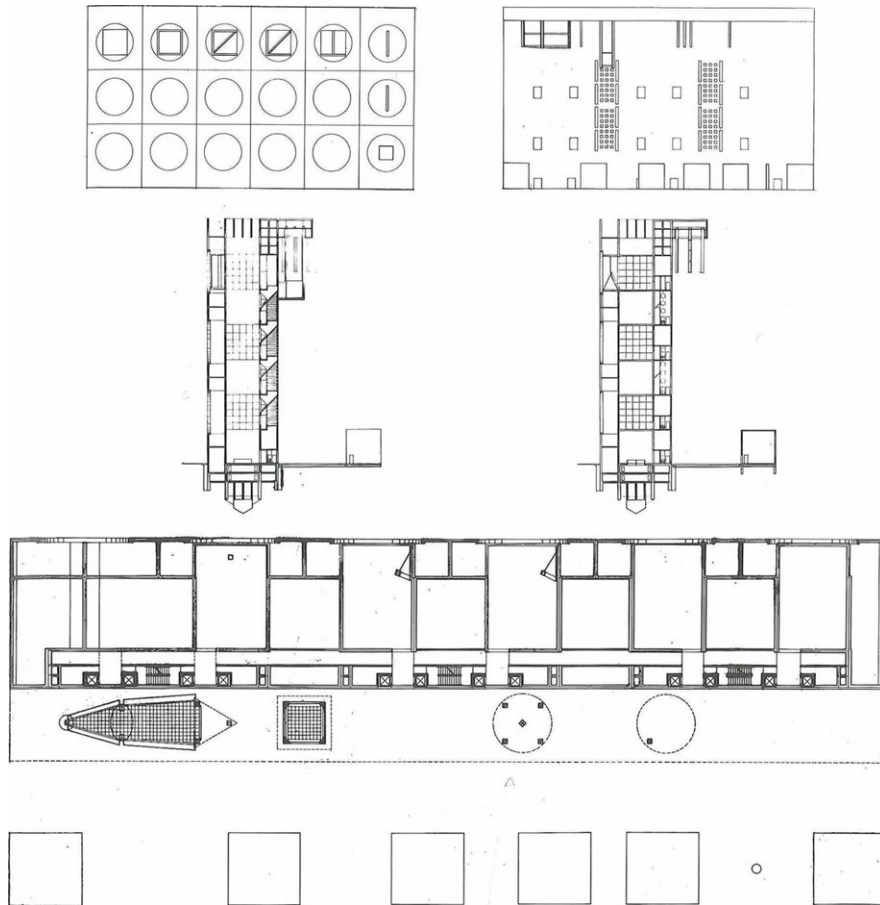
From top to bottom, left to right: The perforated wall. Façade on the distribution and service side; Cross sections; Plan at the level of the hanging structures.
